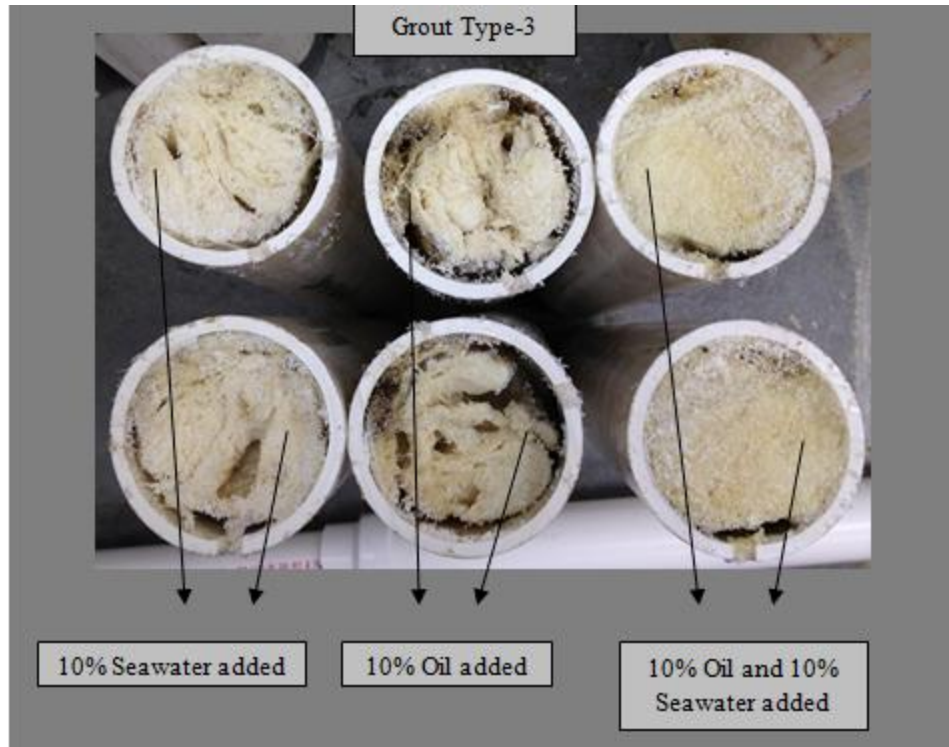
Cross section of the 3 inch grouted pipes with Grout-3, before permeability test
